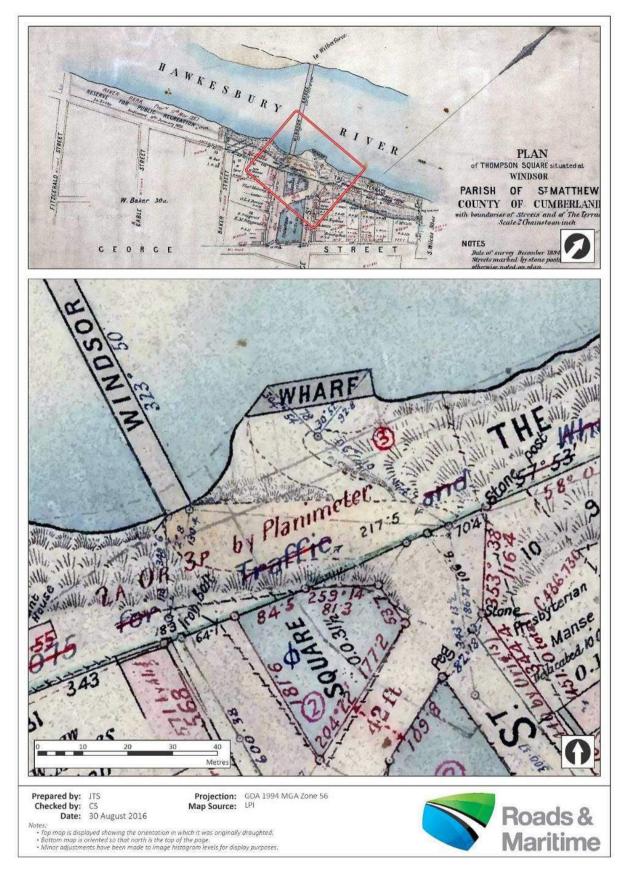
Plan showing the footprint of the new road and bridge construction in 1894.(Source: C. Scrivener, plan of Thompson Square, 1894, LPI, Road Plan R 1009.3000).
